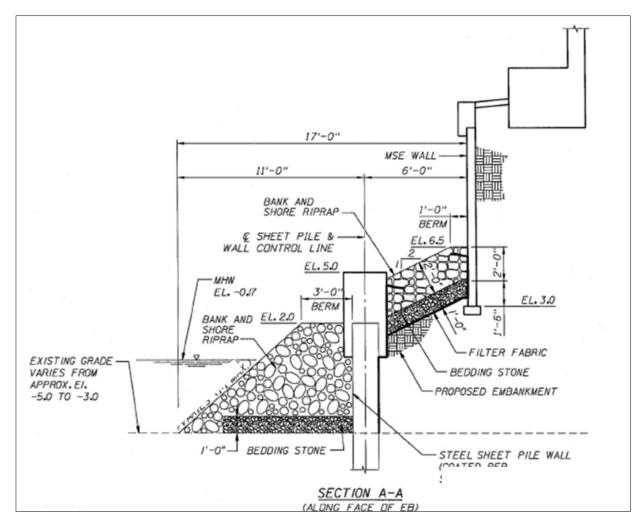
Example of Abutment Protection Design Including a Seawall
